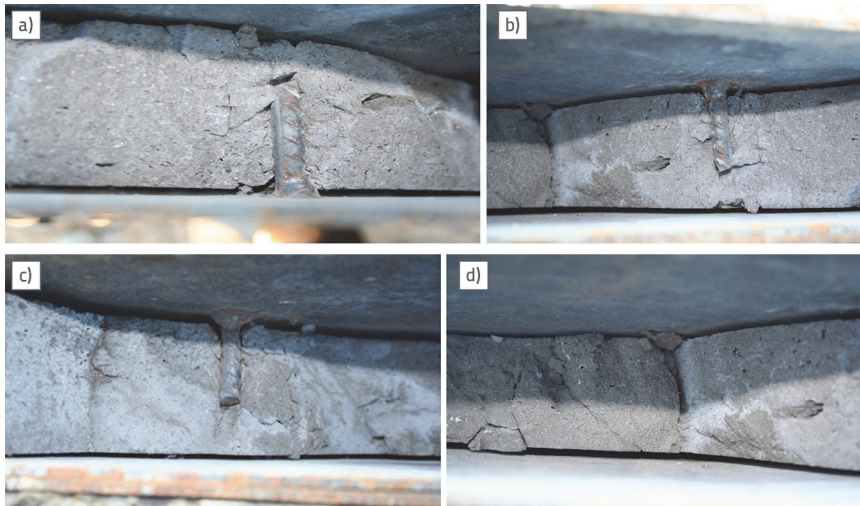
Interior of the central part of the composite panel showing the concrete core, highlighting the concrete core bearing on the steel shear studs welded to the top and bottom plates, and the compressive crushing of the concrete bearing on the shear studs
